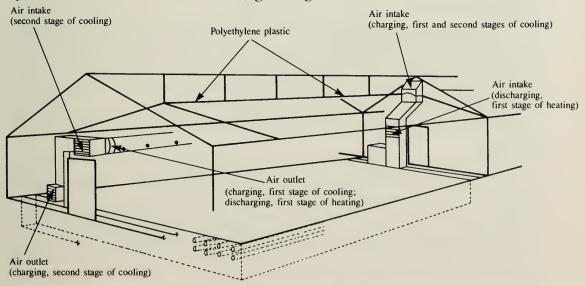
An ETS heating system design for gutter-connected, even-span gable greenhouses.
